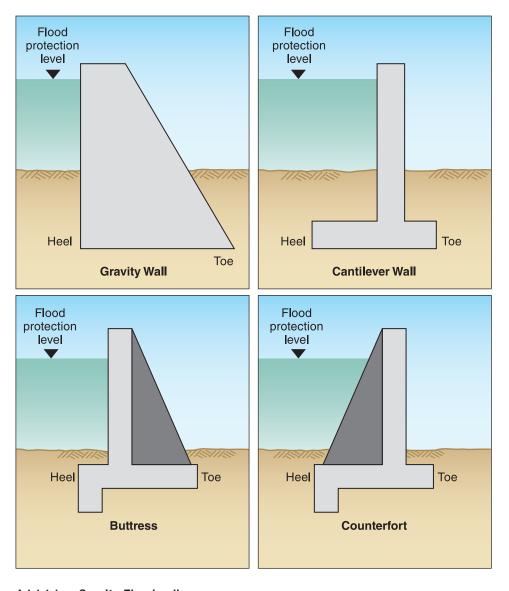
Gravity, cantilever, buttress, and counterfort floodwalls
